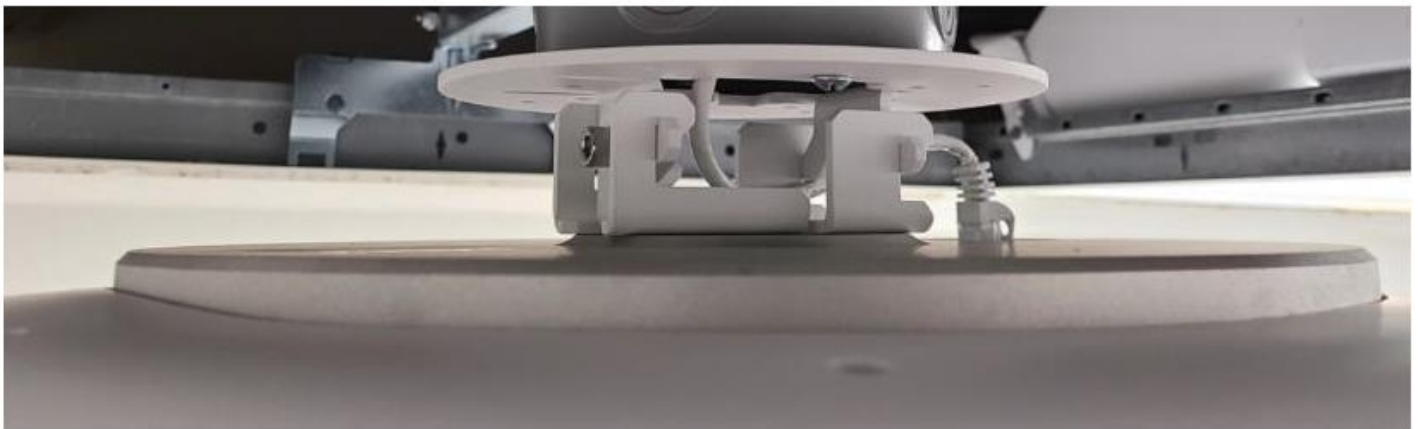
Sensor attachment bracket and Ethernet cable installed.
